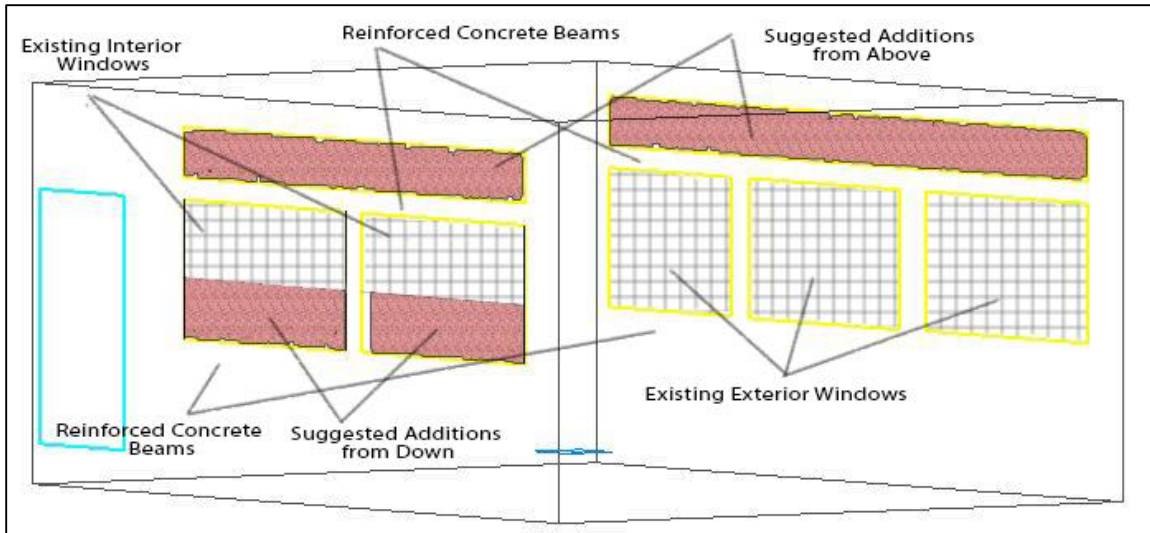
Possible window-wall ratios for a single classroom in Al-Zahra school
